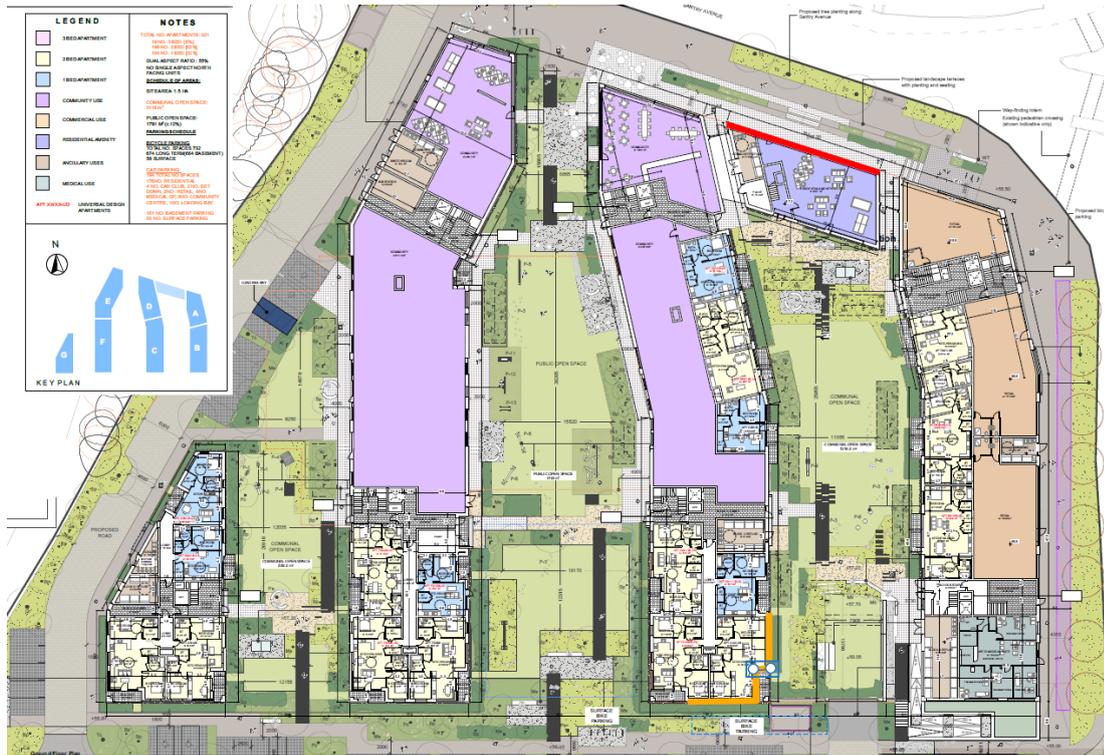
Façade Acoustic Requirements – Ground Floor
